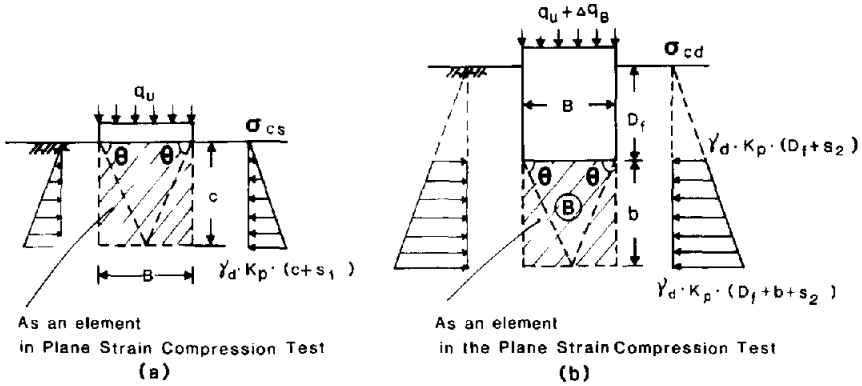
Simplified failure modes for unreinforced ground; (a) surface footing, and (b) deep footing.
